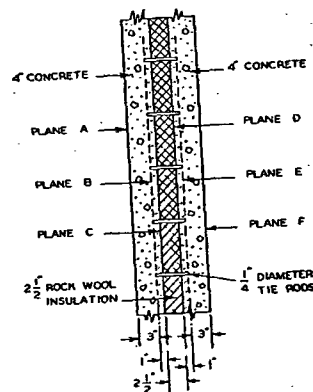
SECTION OF CONCRETE WALL HAVING STEEL TIE RODS AND INSULATION
